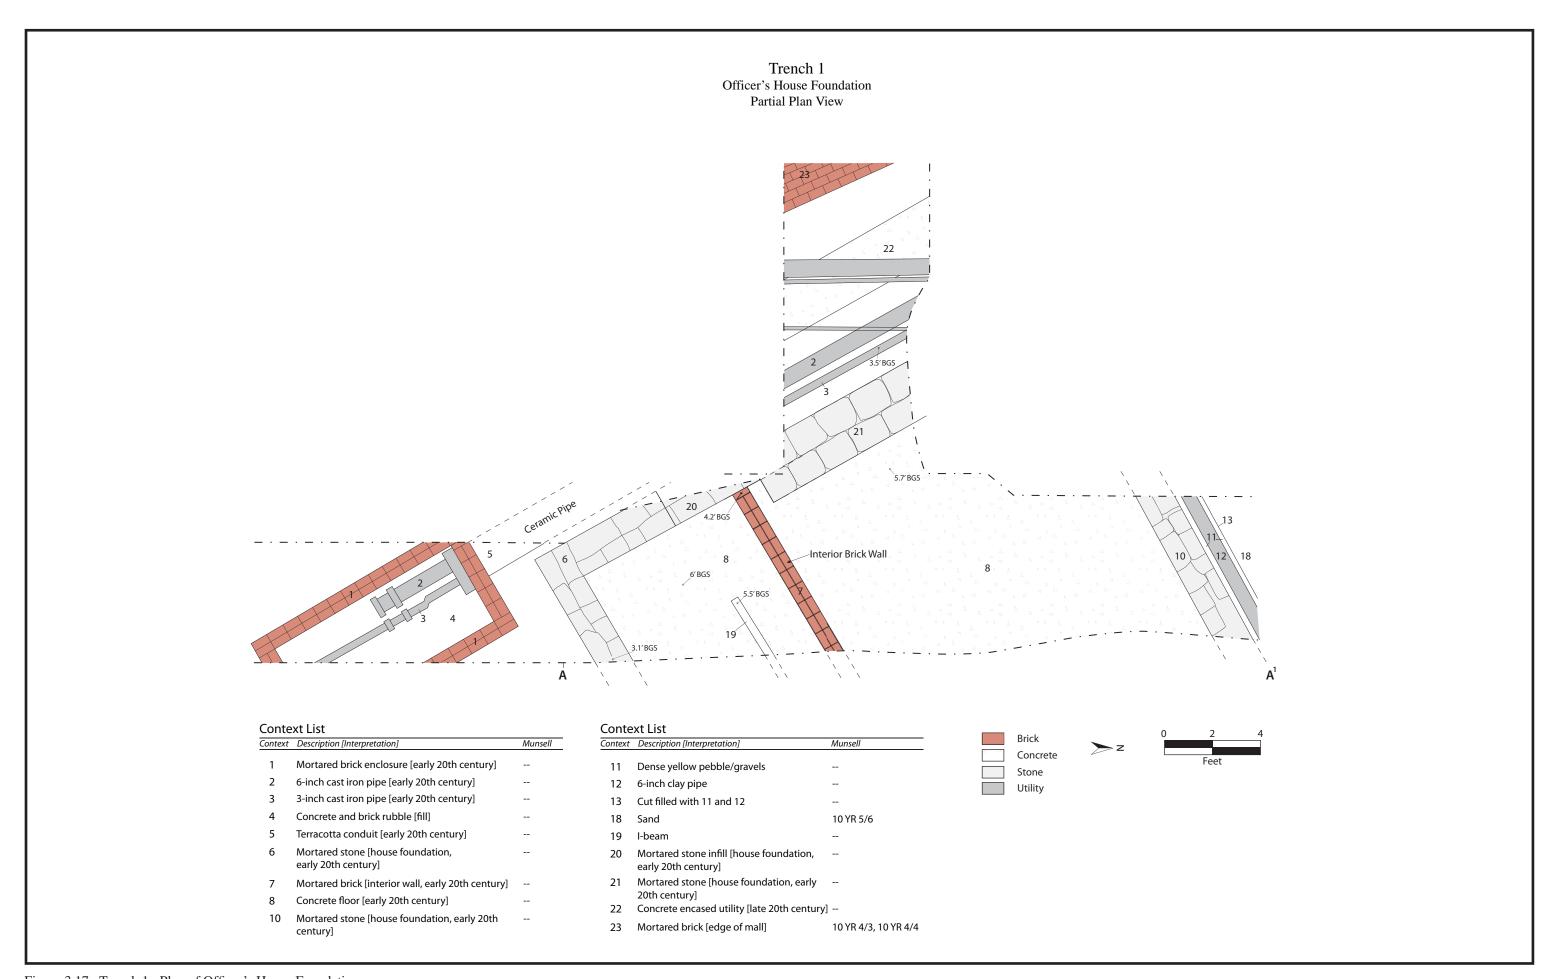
Trench 1: Plan of Officer's House Foundation.
